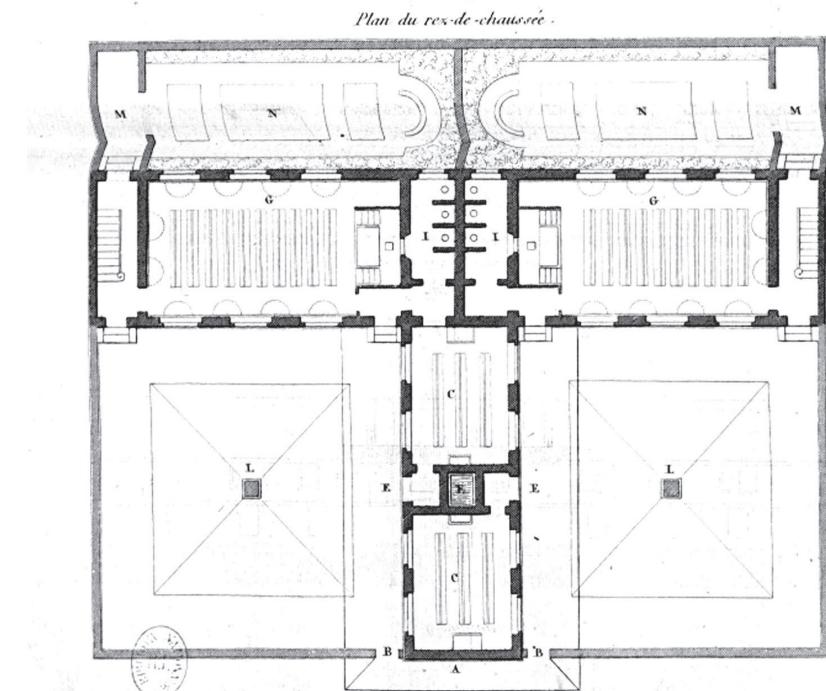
School floor plan for 160 students, boys and girls [Bouillon, *De la construction des maisons d'école primaire*, sheet 3].
